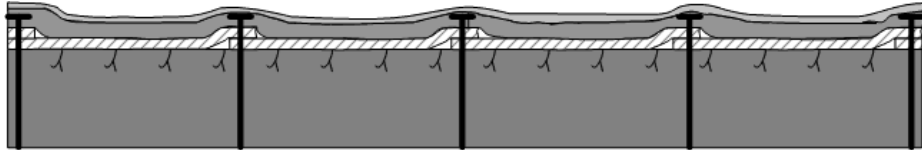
Shotcreted drain on rock – one strip of drain mat covering cracks in the rock. From Holmgren and Ansell (2008b).
